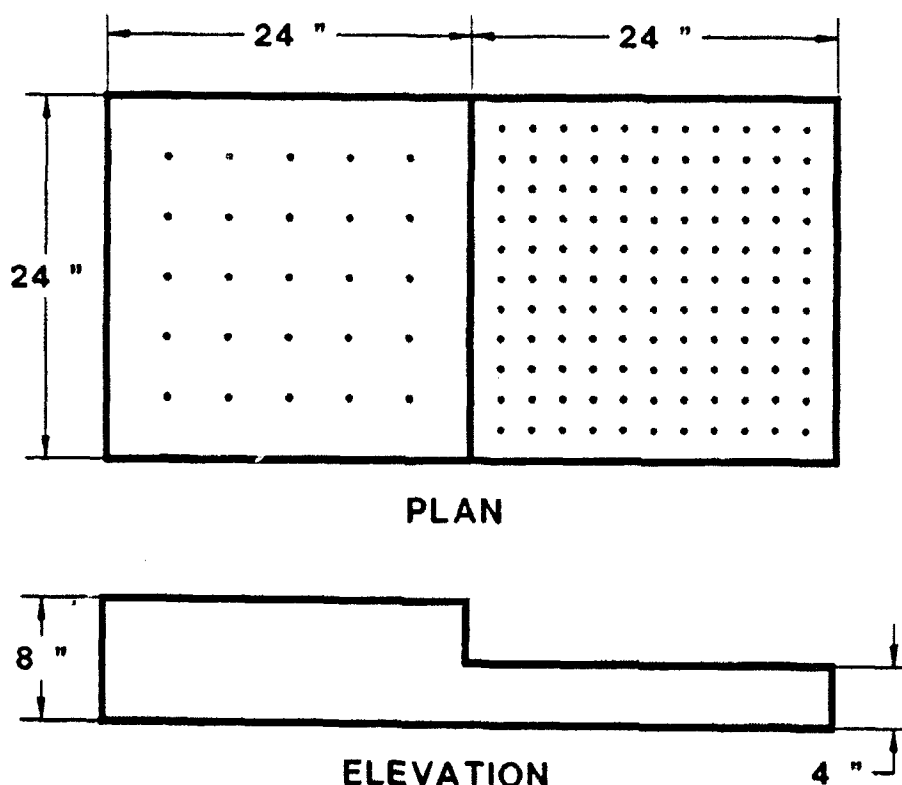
Standard Multilevel Roof Model with 1:30 Scale
